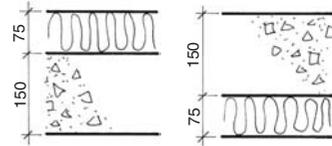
Sequence of layers in an insulated concrete roof slab.
